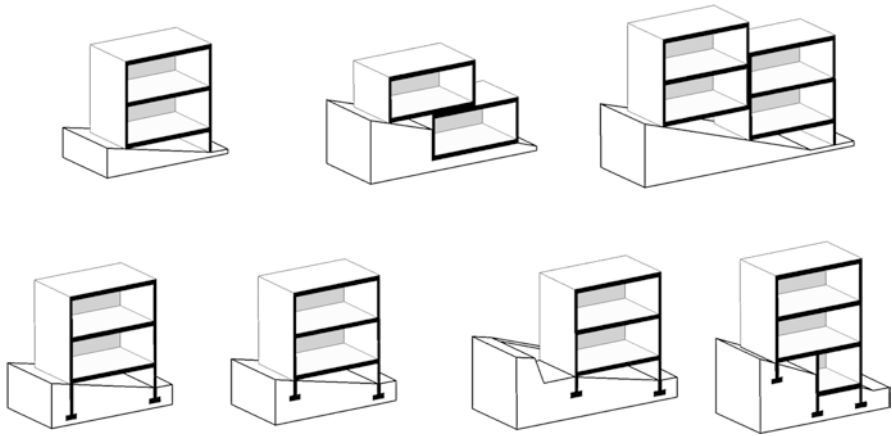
Buildings can be made to fit a sloping site in variety of ways
